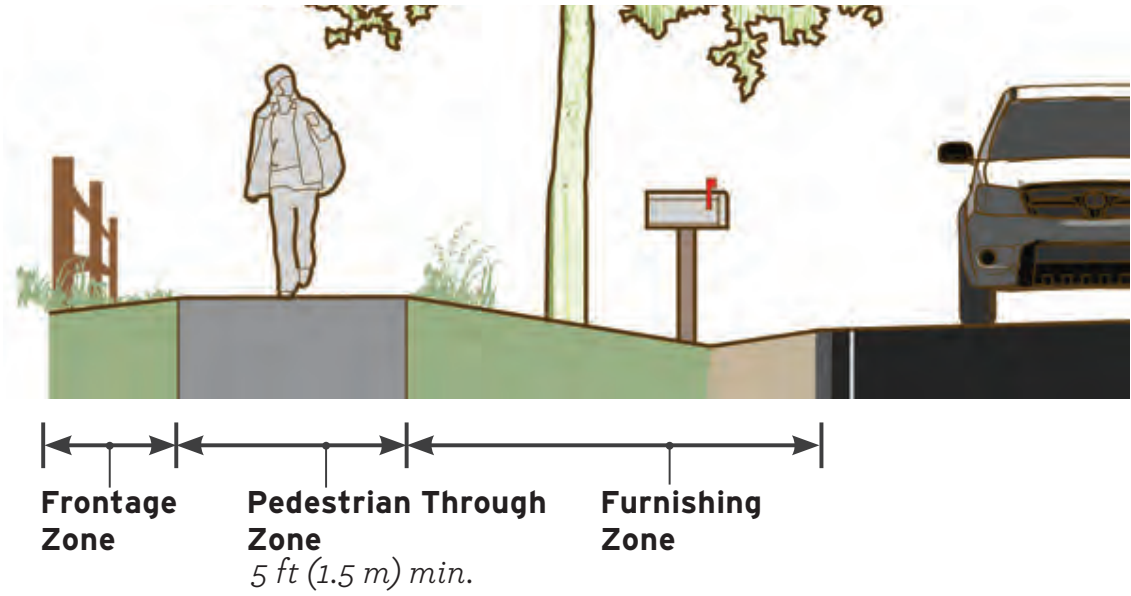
Sidewalks should be physically separated from the roadway by an unpaved buffer separation, barrier or curb edge. (Source: Small Town and Rural Design Guide)
